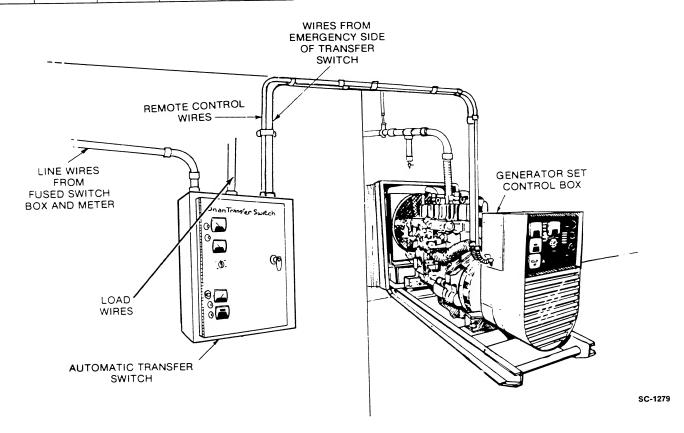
TYPICAL WALL MOUNT INSTALLATION
